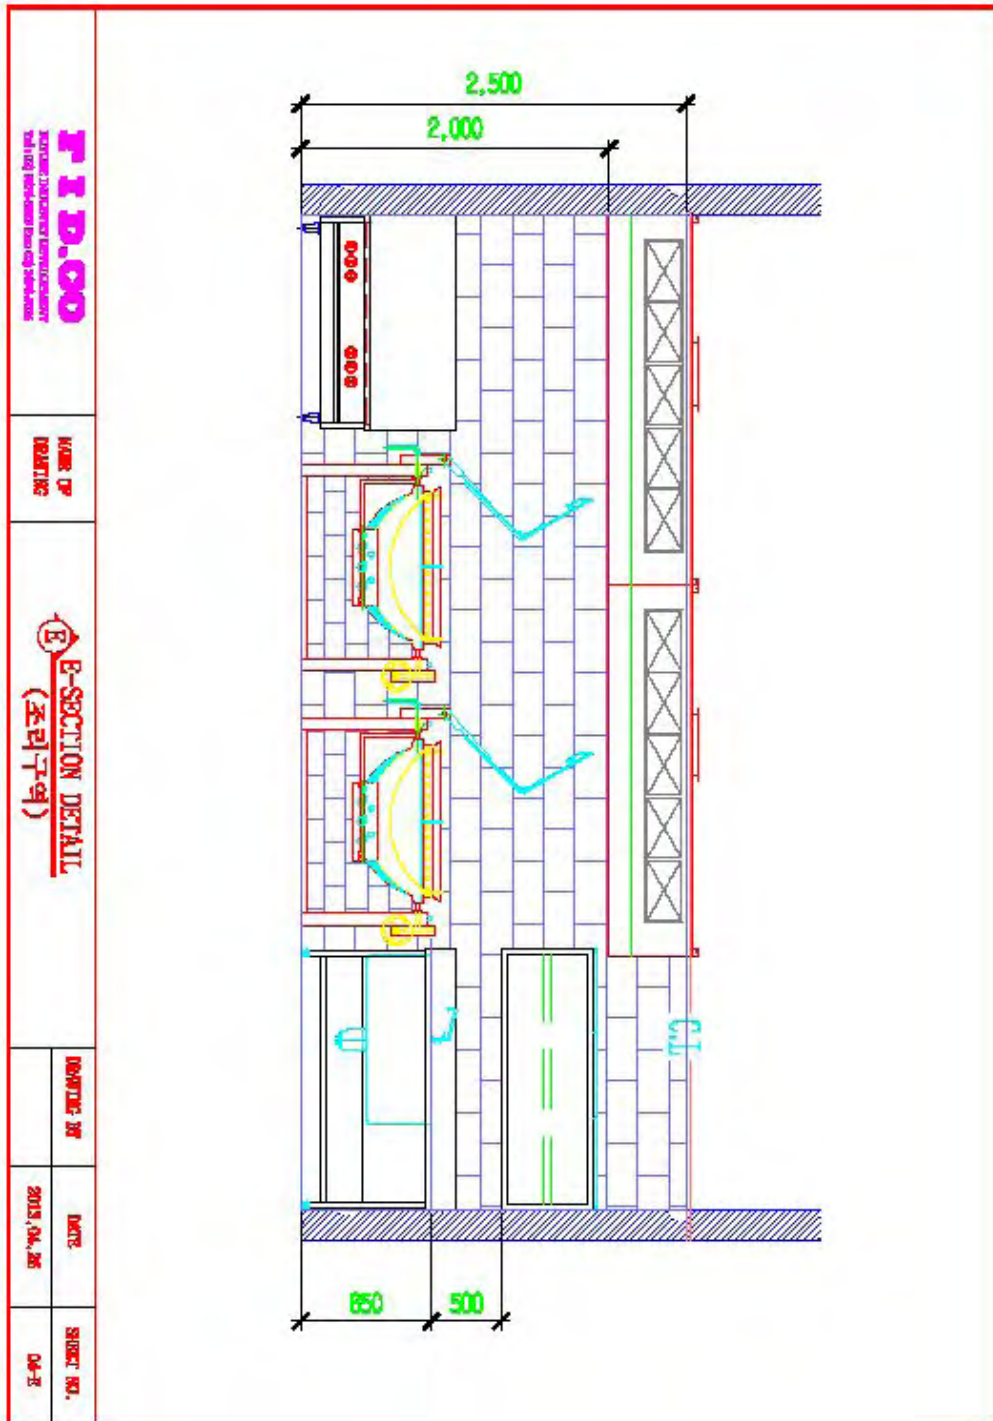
Elevation for Seollungtang speciality restaurant : section E
